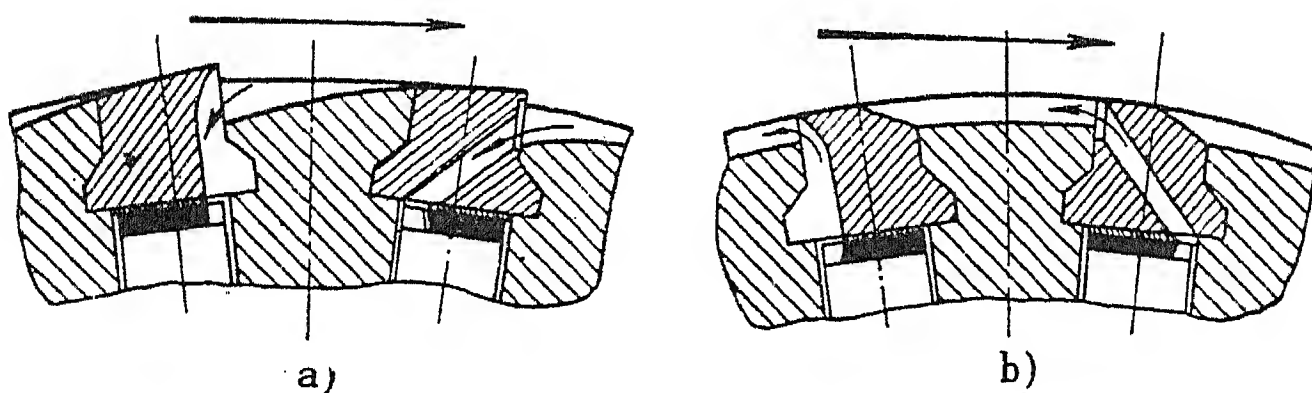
Section through teeth and slot wedges a - gas inlet zone; b - gas outlet zone
